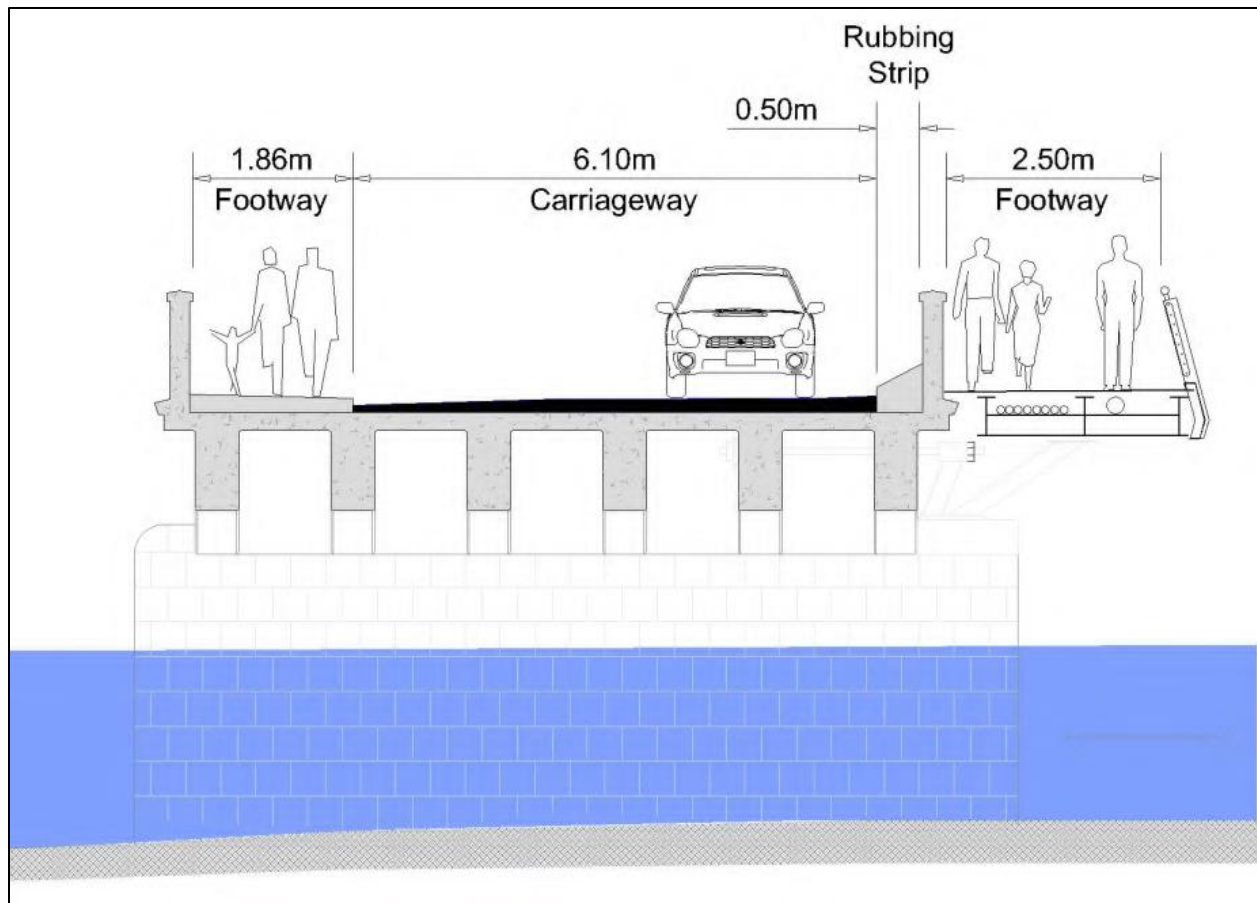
Existing Cross Section of Wolfe Tone Bridge (Facing West)²
